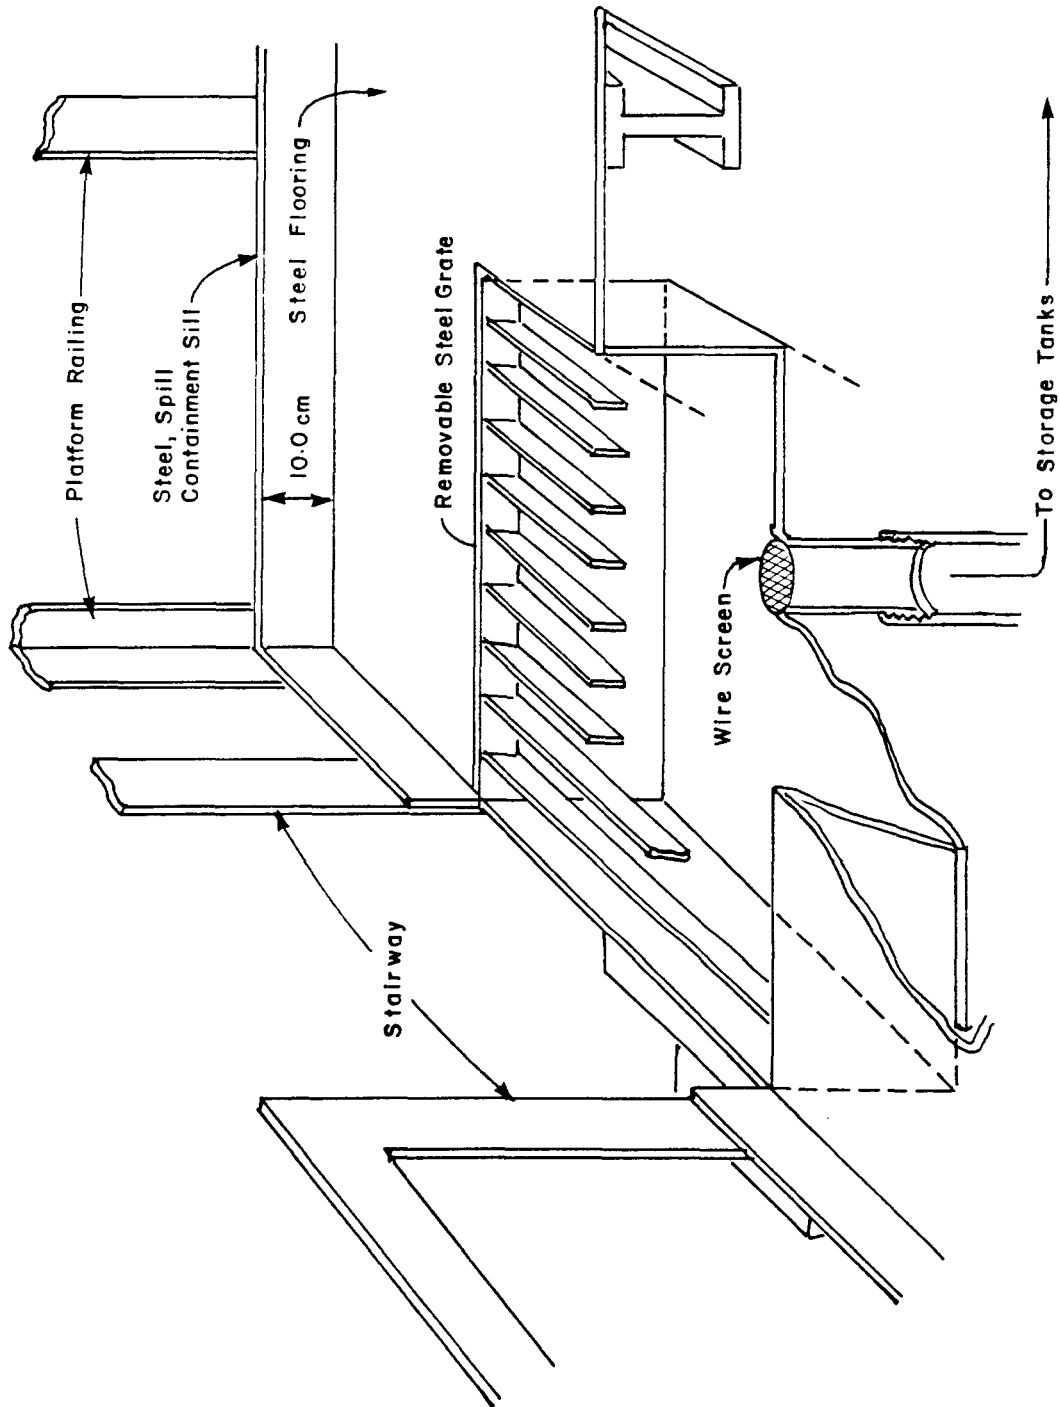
SPILL CONTROL AT MEZZANINE STAIRWELL
